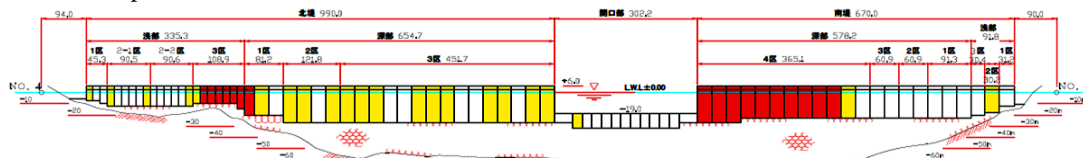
State of damage of Breakwater (Red : No damage, Yellow : Tilted, White : Sliding down)
